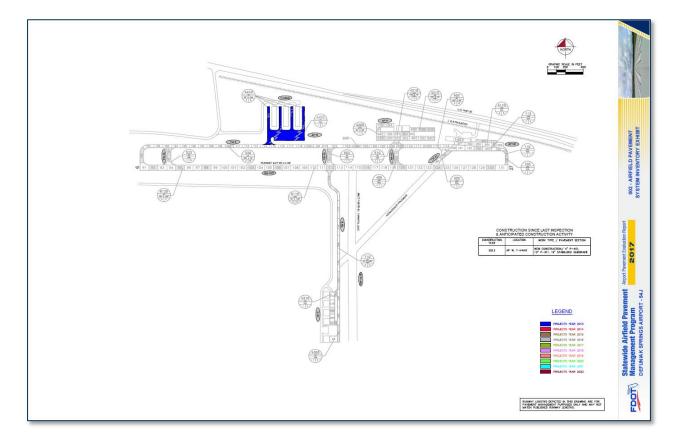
2017 Airfield Pavement Network Definition Exhibit
